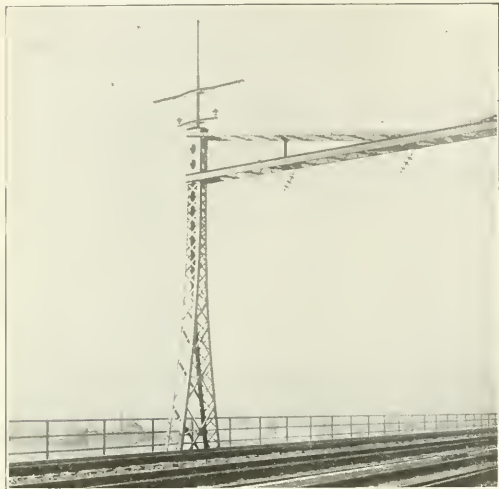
Type of Post Used to Span Bridge Expansion Joints
